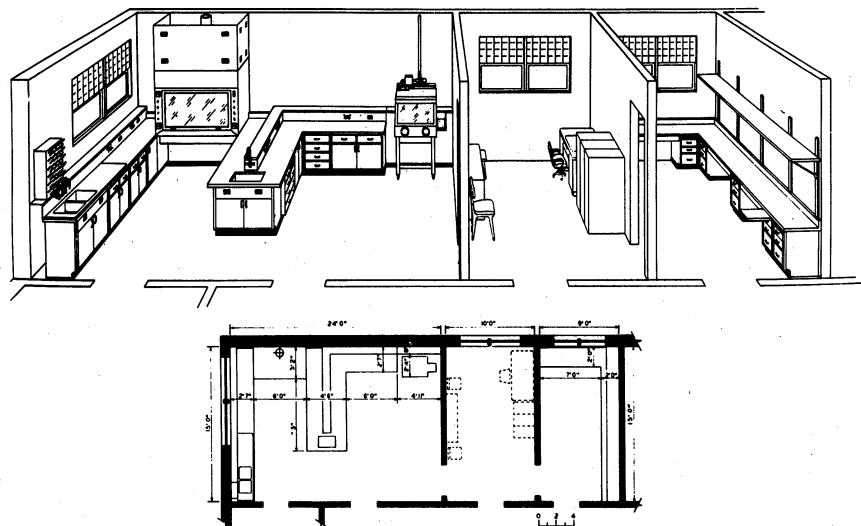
Isometric and plan view for a typical three-room radioisotope tracer laboratory (Courtesy of Kewaunee Mfg. Co., Adrian, Michigan)
